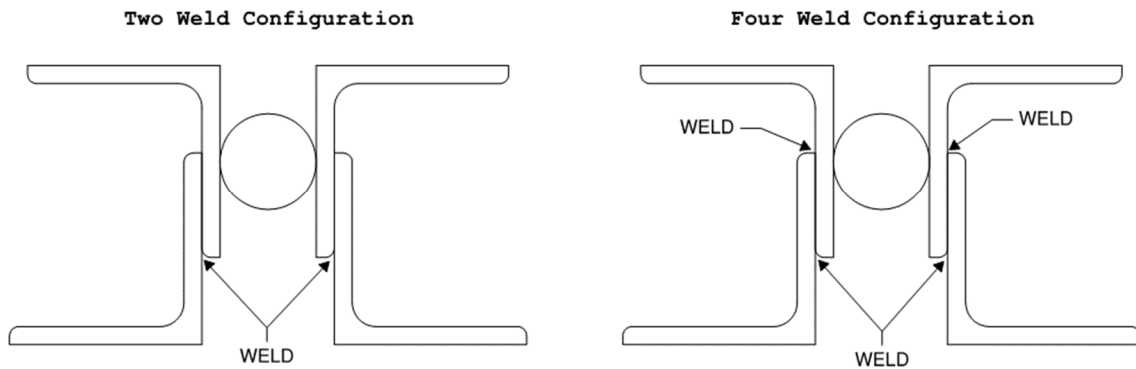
Two Weld vs. Four Weld Lapped Configuration
